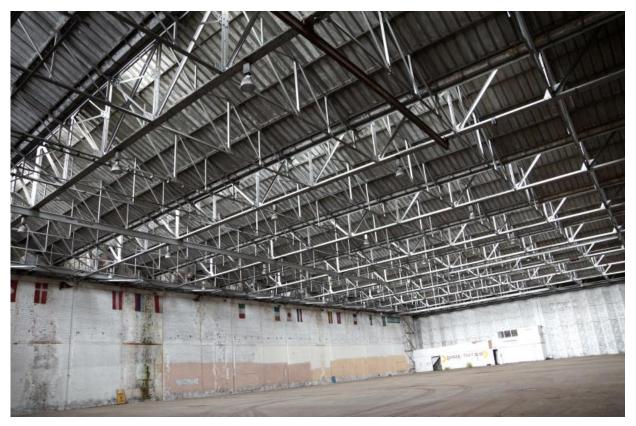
Dope Shop – interior view showing lattice roof girders and north-light trusses
